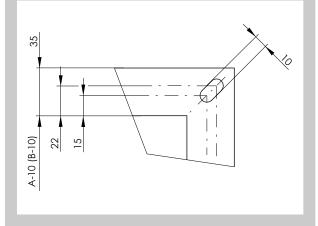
Flage of rectangular damper - INSTALLATIONS SIDE
